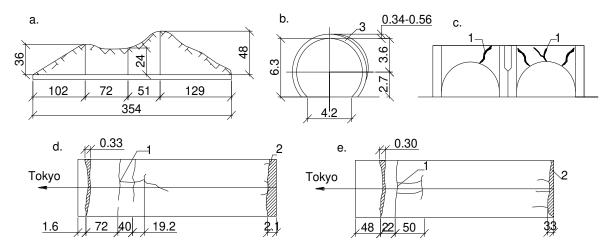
Hakone tunnels - Kanto earthquake damage: a-long profile, b-type cross-section, c-damage to portals, d-damages to the vault 1-faults, cracks, 2- vault crash, 3- remnant movement.
